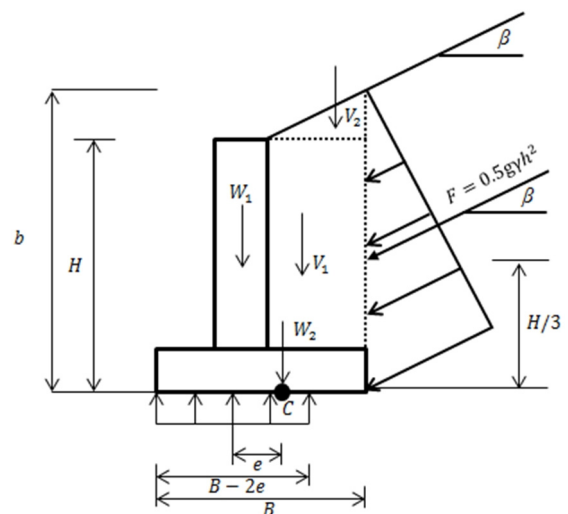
Load on retaining wall modified after MOLIT (2016)
